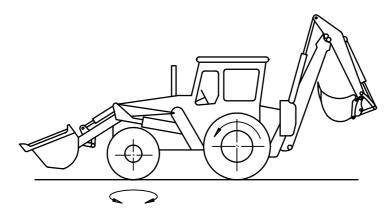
Rigid frame, front wheel steer, rear wheel drive
